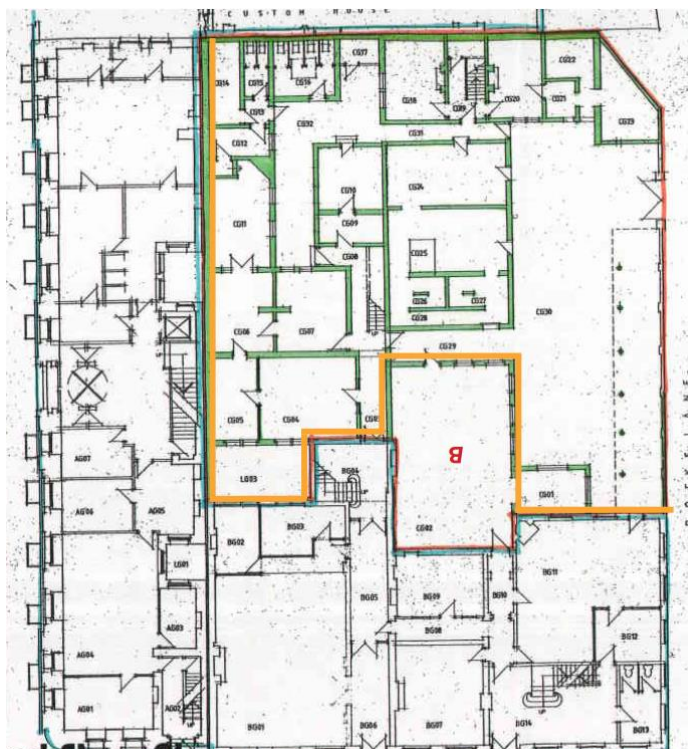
Demolition Gd Floor Plan, Heritage Assessment, p.22
